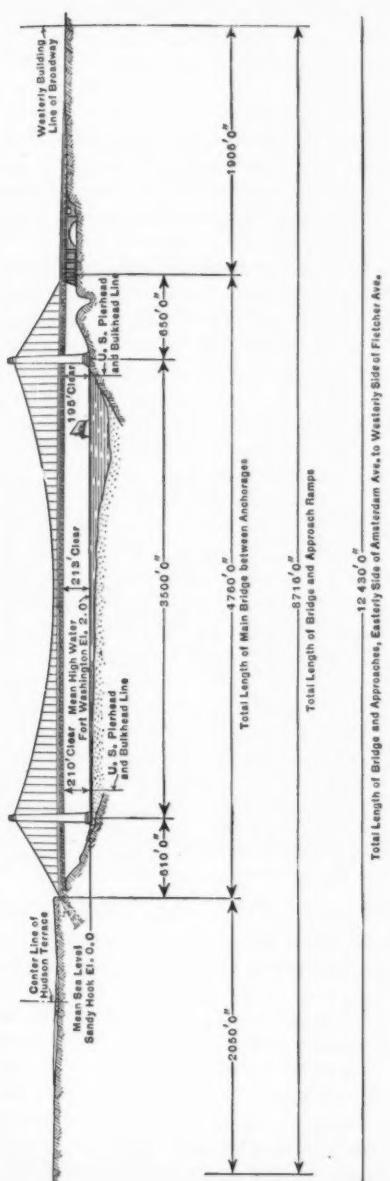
GENERAL PLAN AND ELEVATION, GEORGE WASHINGTON BRIDGE.
